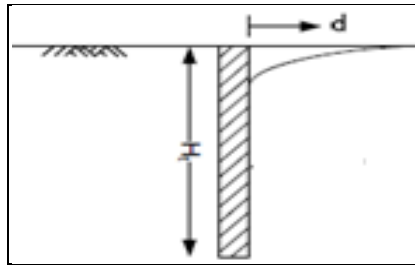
Schematic Zone of cracking due to pile driving [20]
